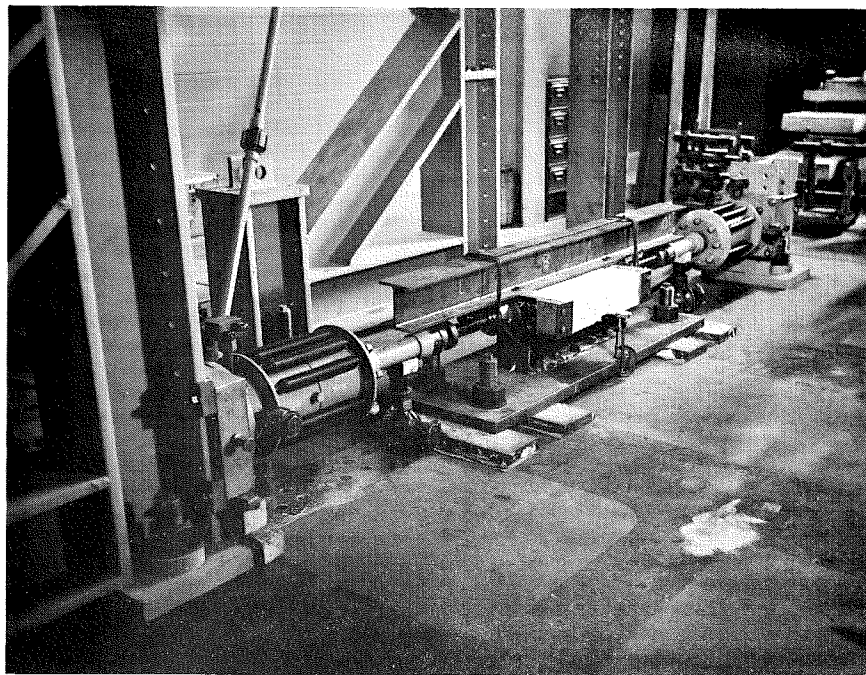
TEST SETUP FOR STRESS REVERSAL TESTS
